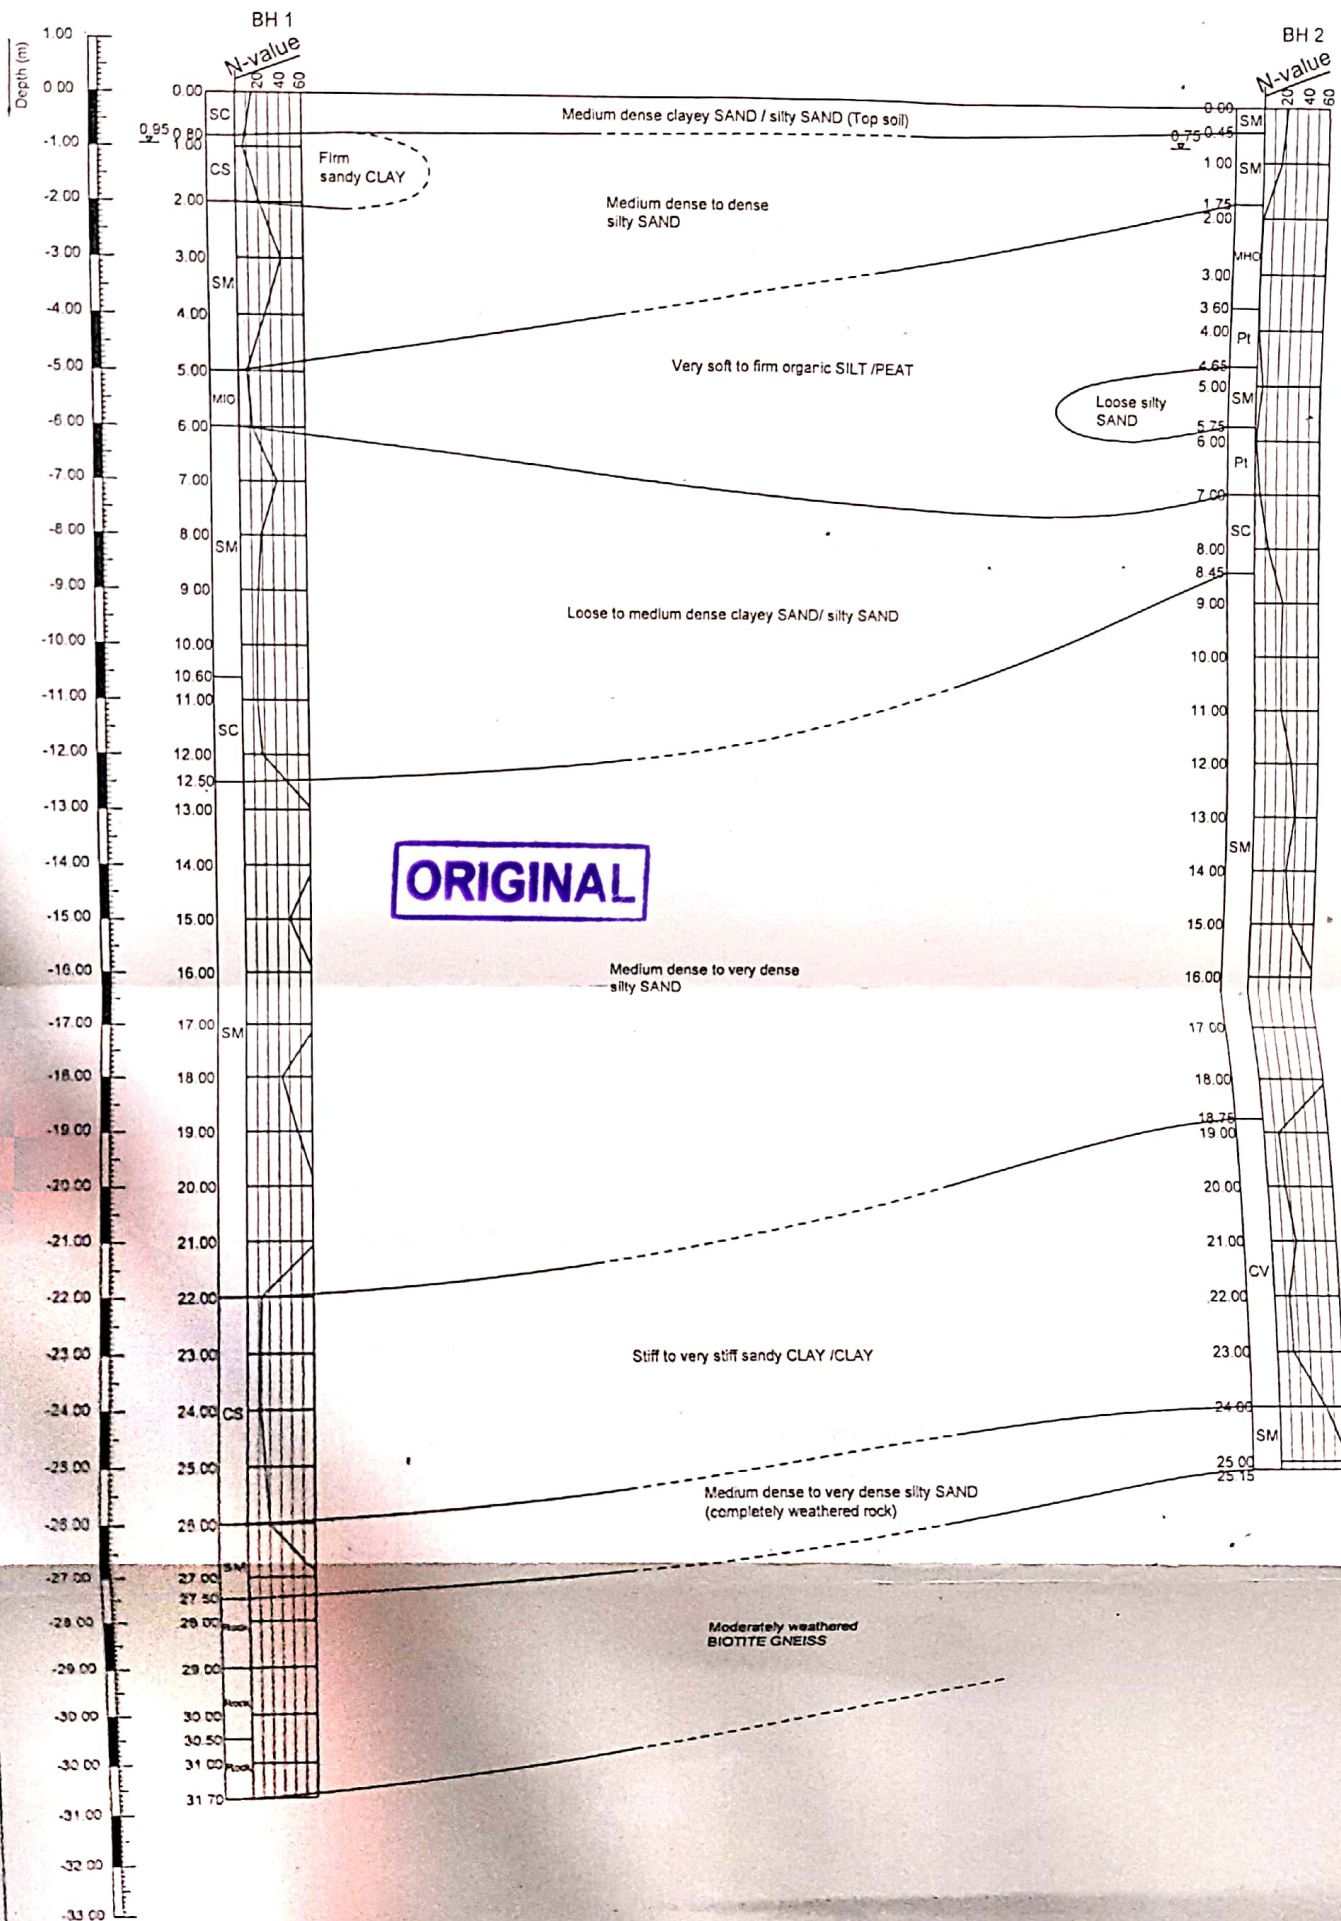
Figure II :- Assumed vertical ground profile through BH 1 & BH 2
